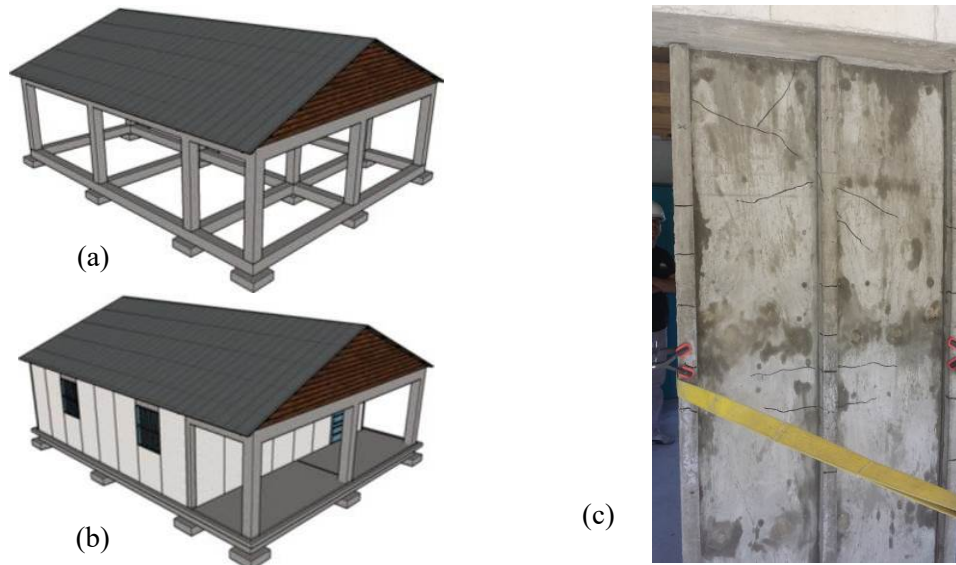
(a) Structural system (with roof) for house configuration with 4 rooms and covered porch and (b) house clad with prefabricated panels; (c) ribbed panel, shown while testing out of plane strength
